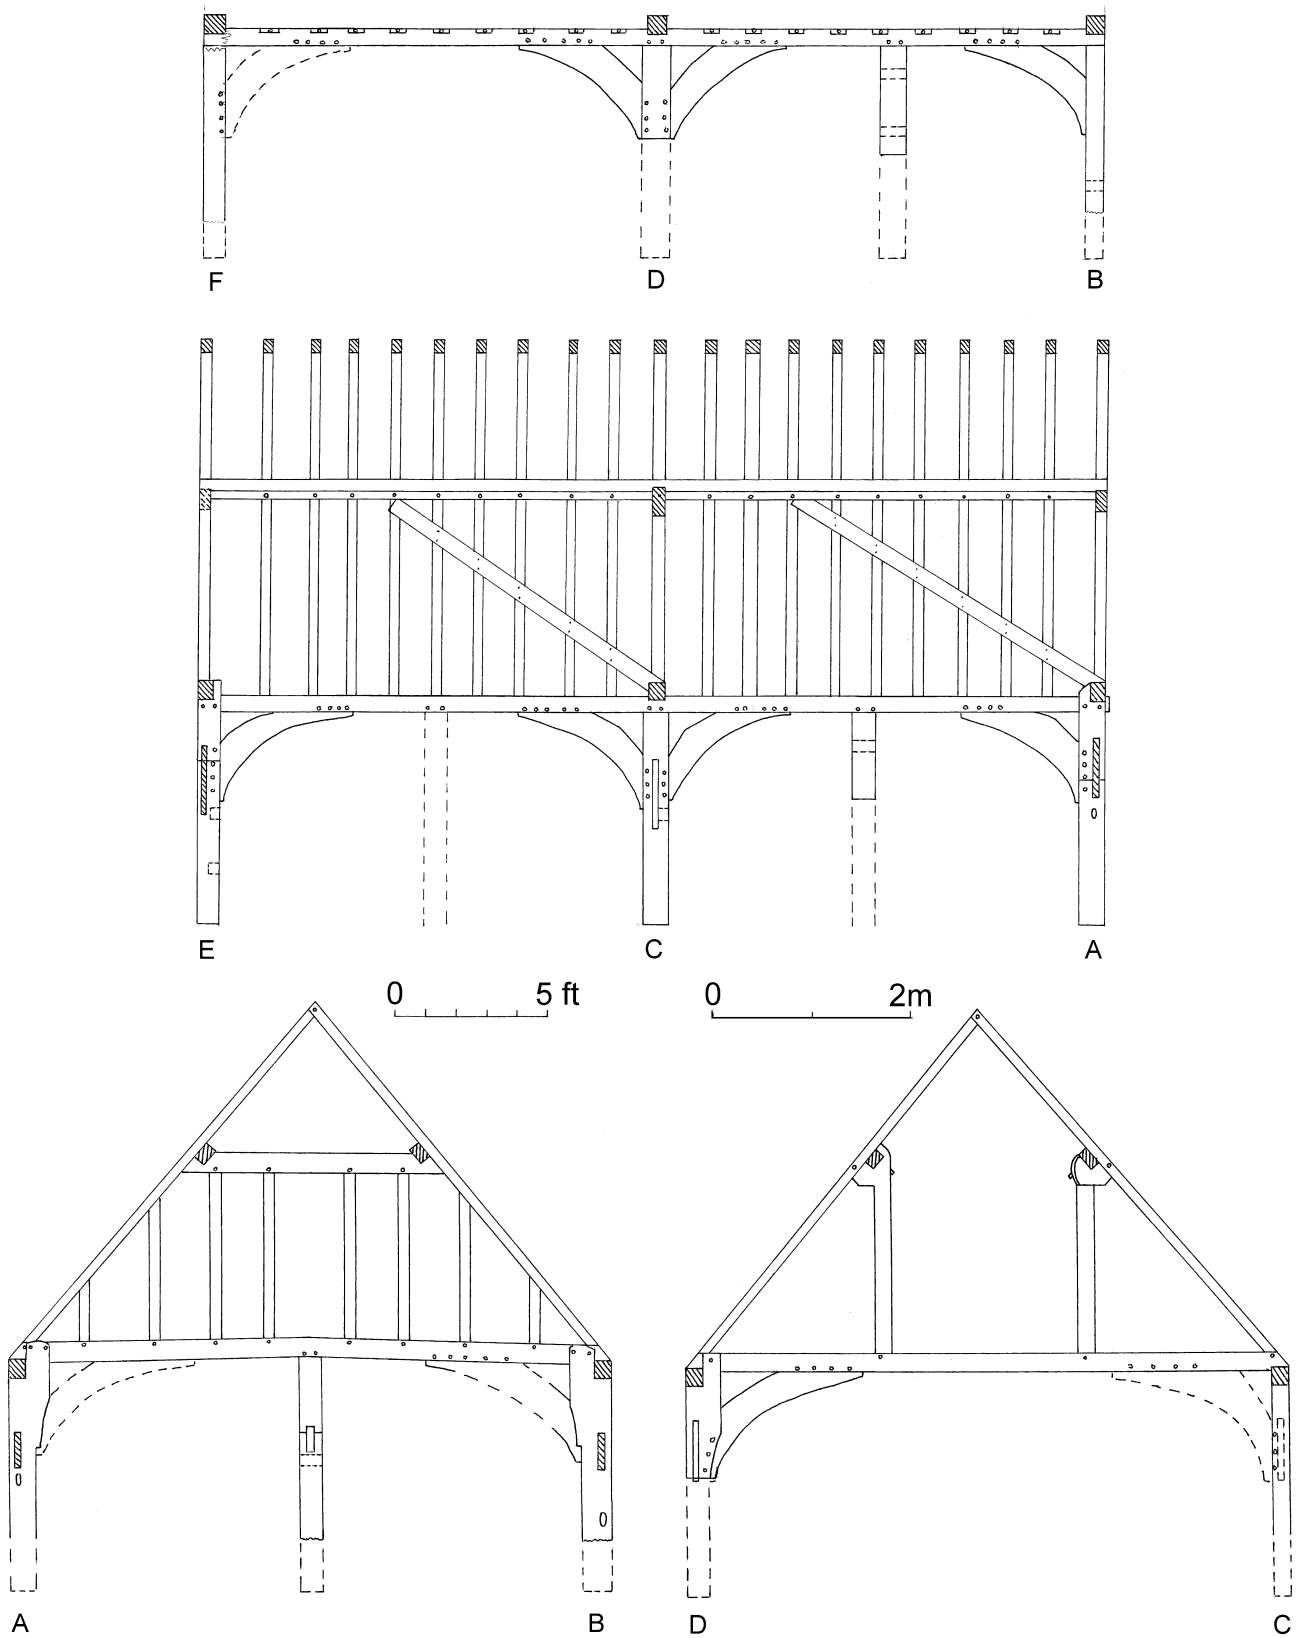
Coggeshall Abbey outbuilding, from top to bottom and left to right: front elevation of the building; elevation of the rear wall viewed from inside; right hand end elevation from inside; and central truss.
